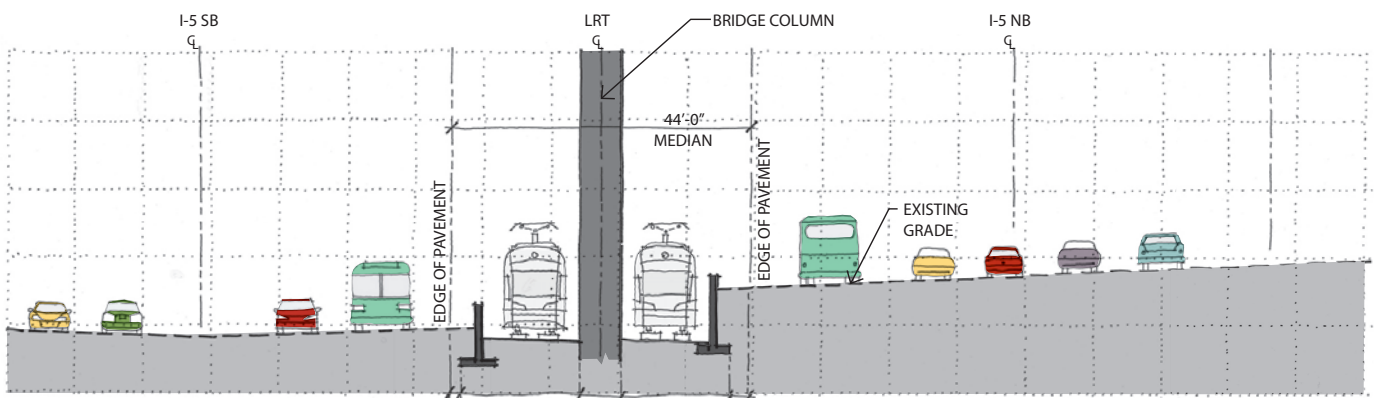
L1: Level 2 I-5 Light Rail Alternative Detail - 4 of 4
